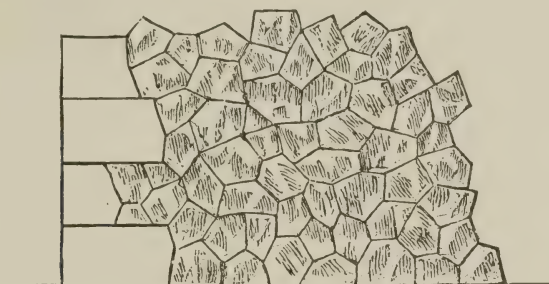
Random Rubble with Hammer-dressed Joints and no Spalls on Face.
